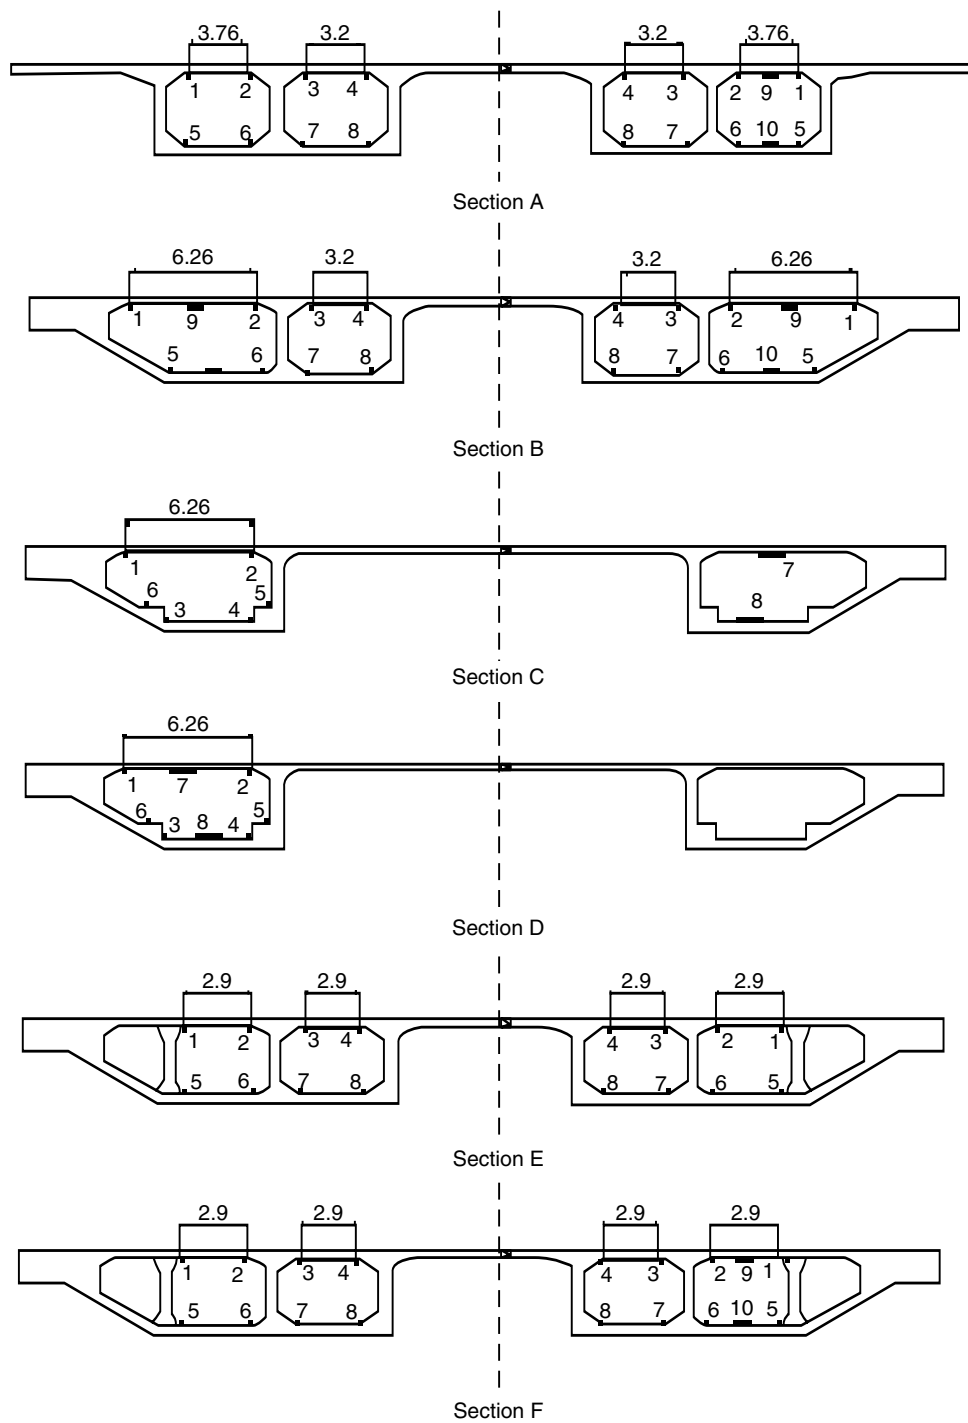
Profile of the critical cross-sections (engineering drawing of design scheme, unit: m)
